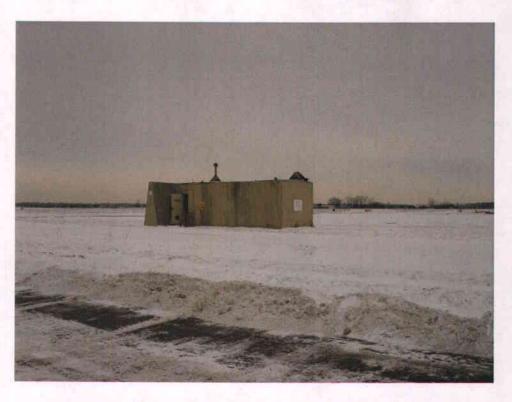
AFP 85: Building 49 and storage tank associated with Building 25 (FRA-8381-12).
